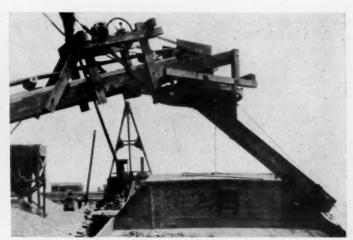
View along inclined conveyor No. 2, showing also, in center, the boom conveyor and chute
